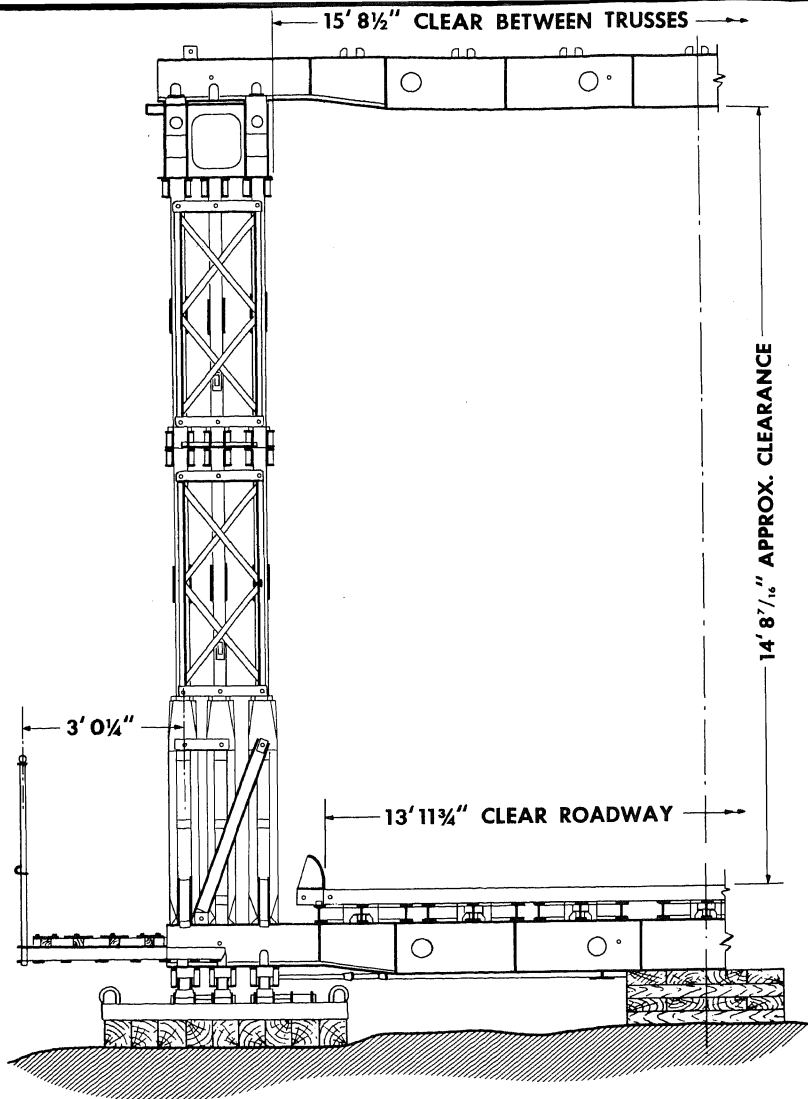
Cross section of extra widened Bailey bridge M8.
